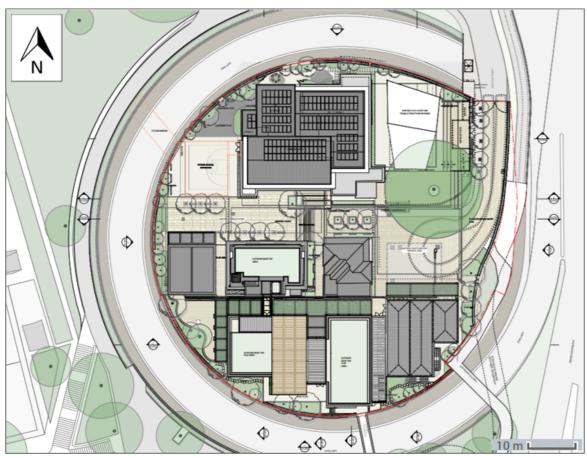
| Roof Level (roof) (Source: Applicant's EIS 2020)
